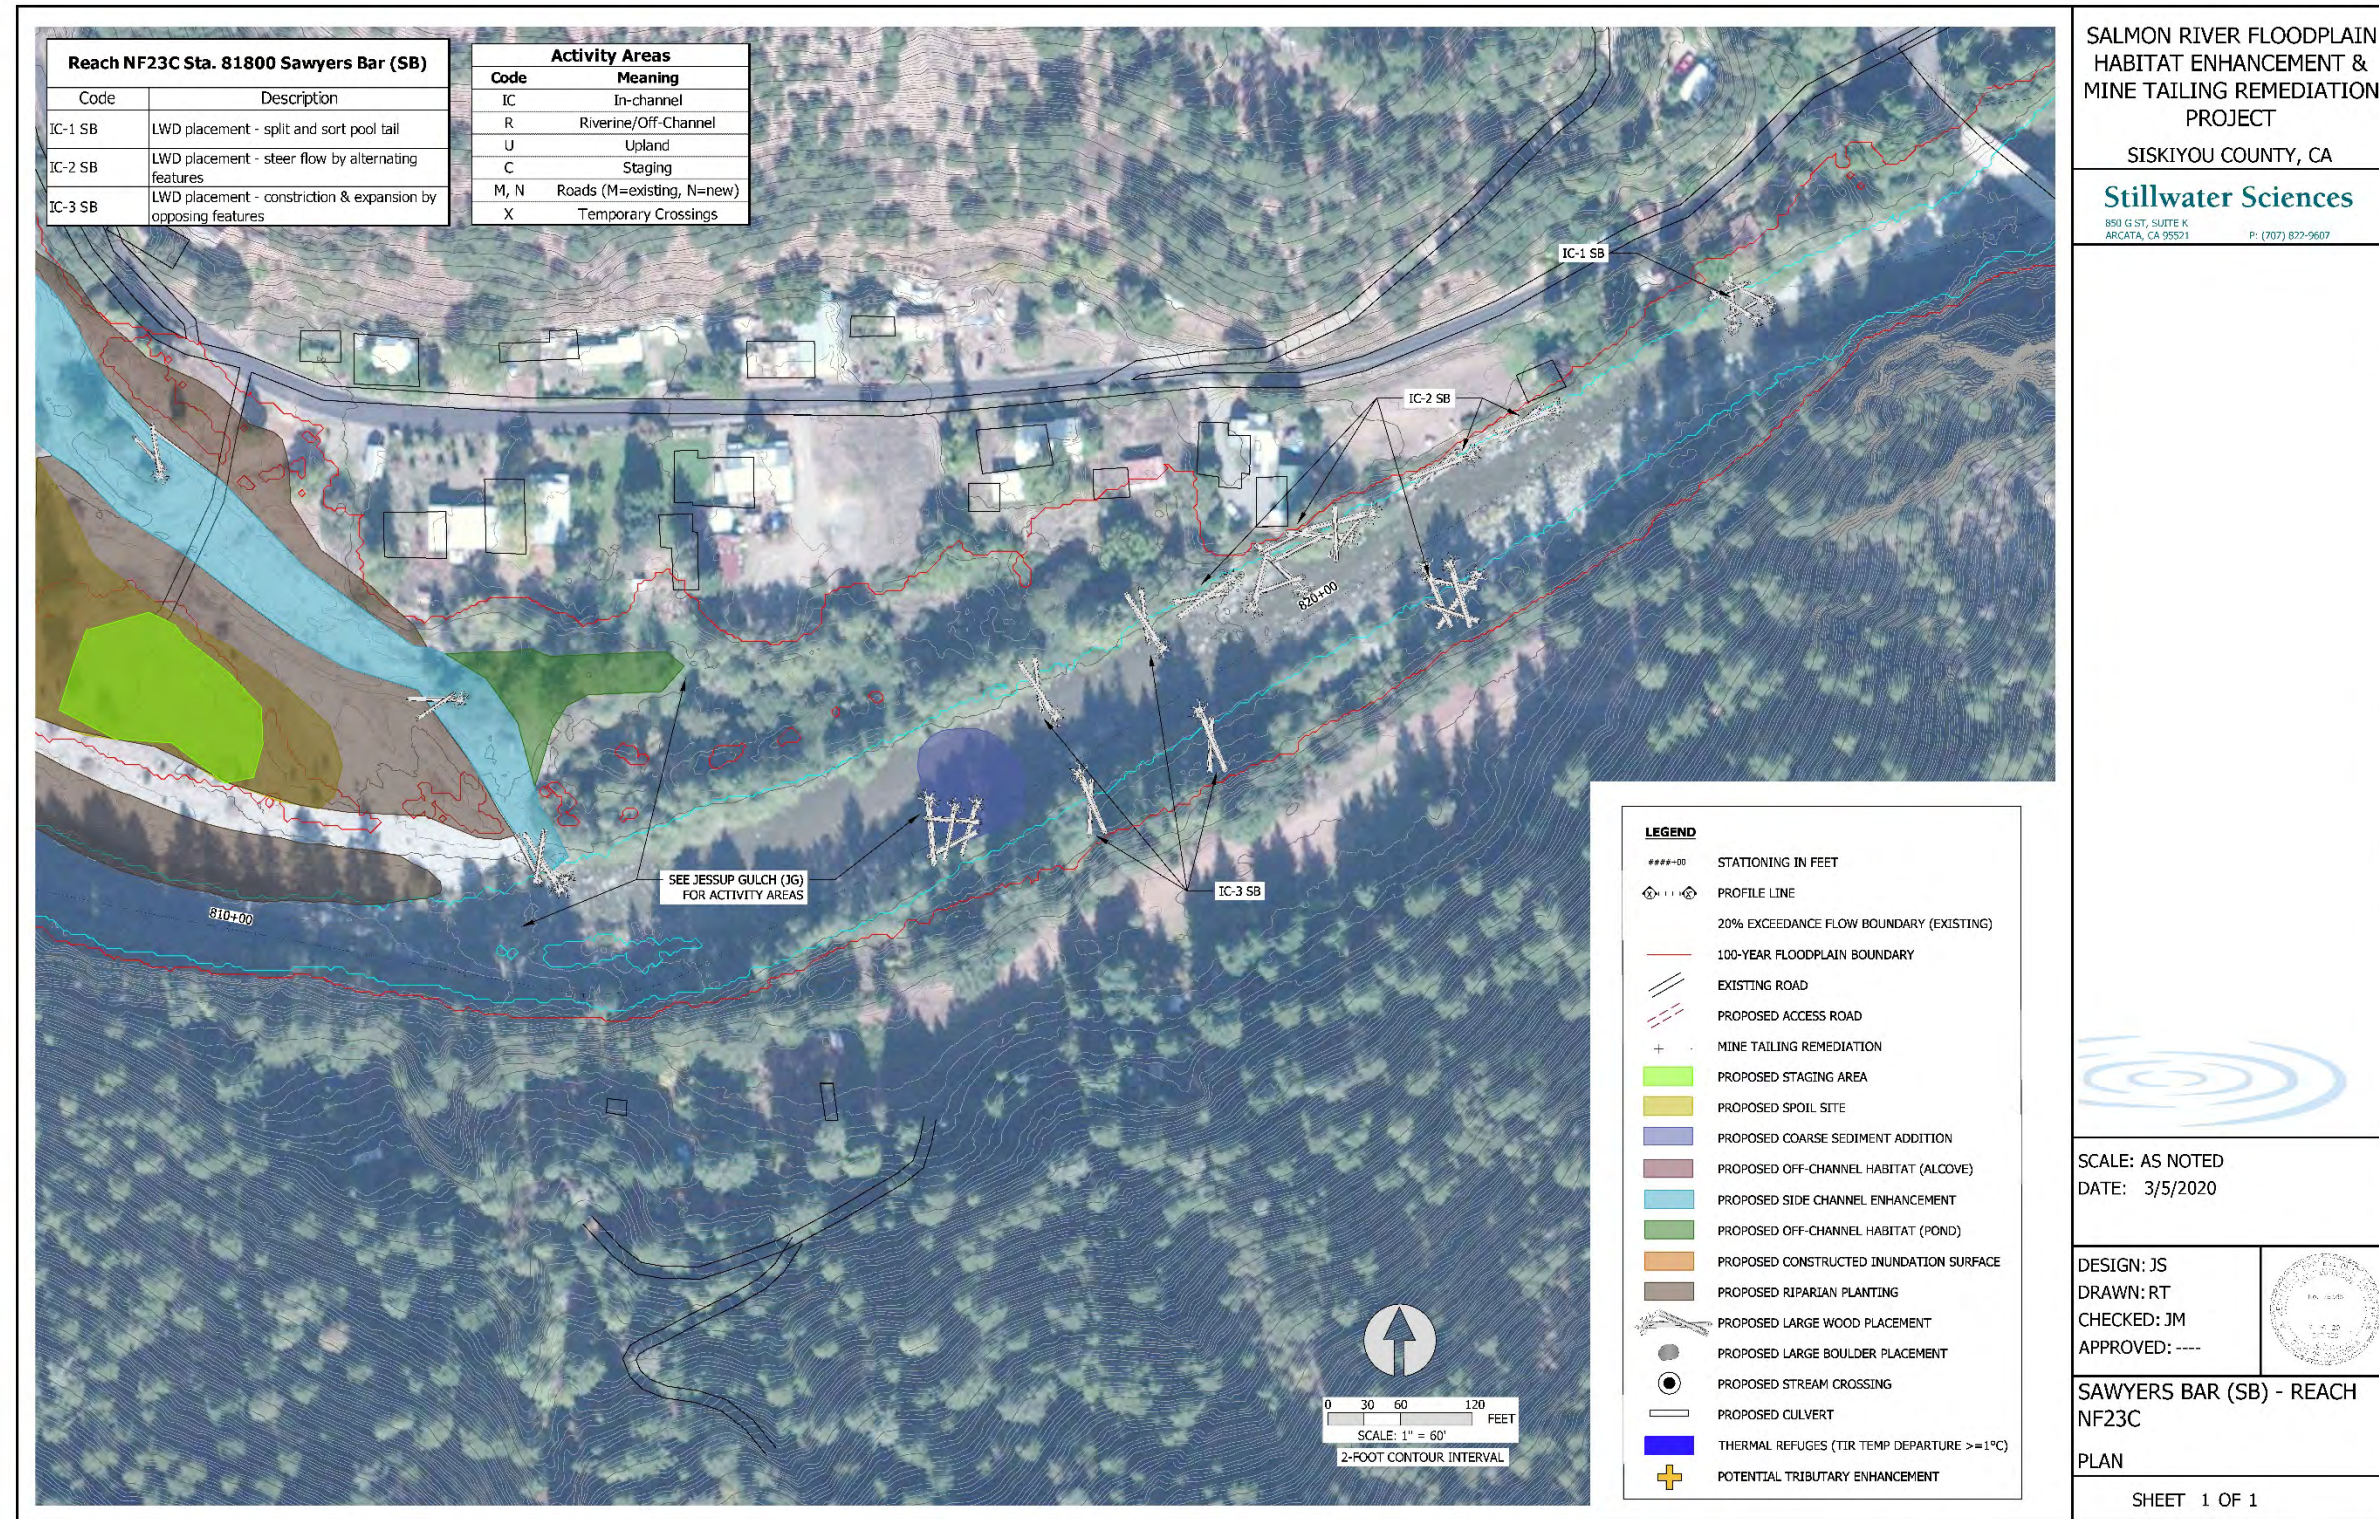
Design plan for North Fork Reach 23C at Sawyers Bar.
